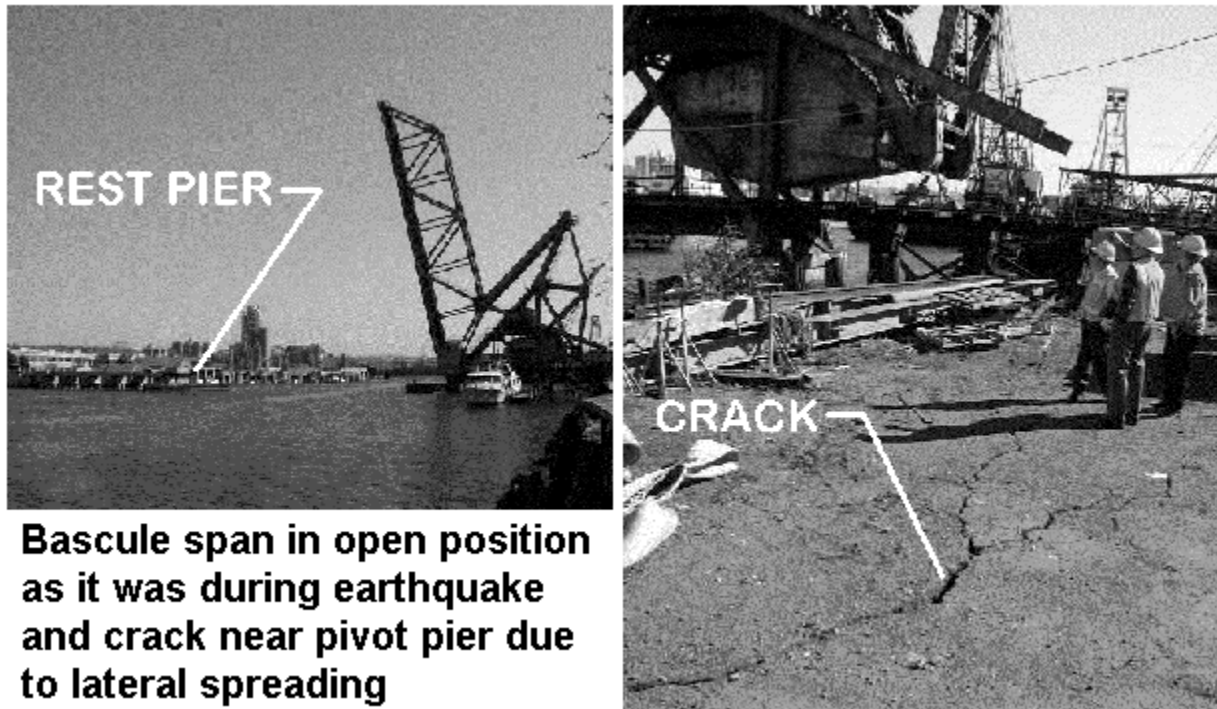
Bascule span in open position and cracks in ground behind pivot pier.
